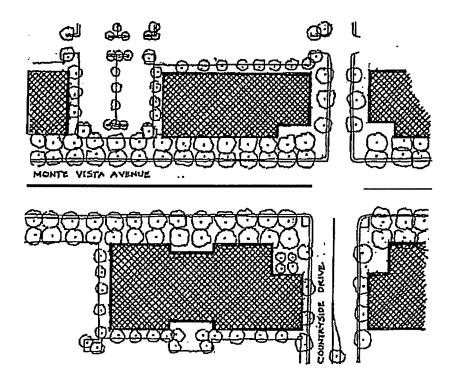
Illustrative Development Plan Monte Vista West Subarea
